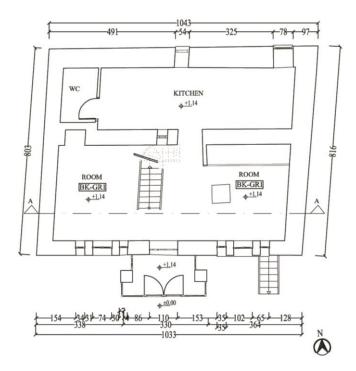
Ground floor plan of Boyacızade Konağı in 1/100 scale (Redrawn by author).
